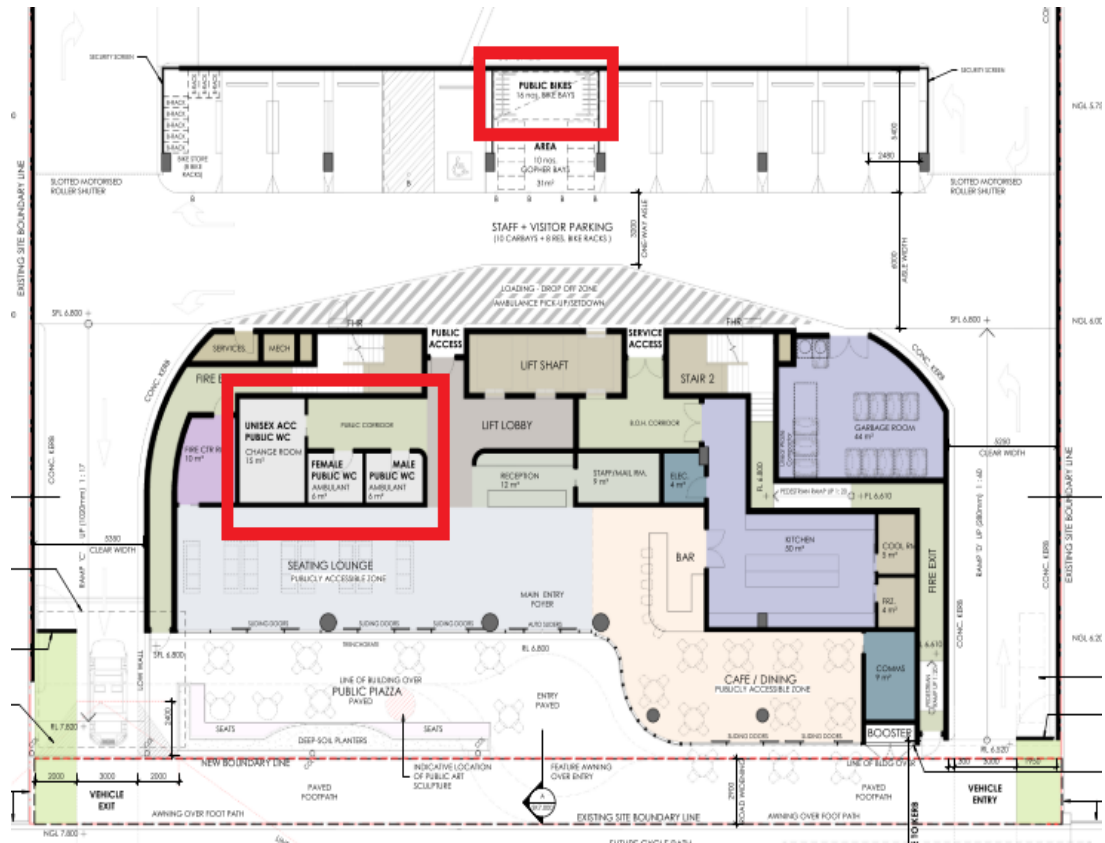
Current ground floor plan with public facilities comprising 1 male toilet, 1 female toilet, 1 universal toilet with shower and adult changing place and bike bays as marked in red
